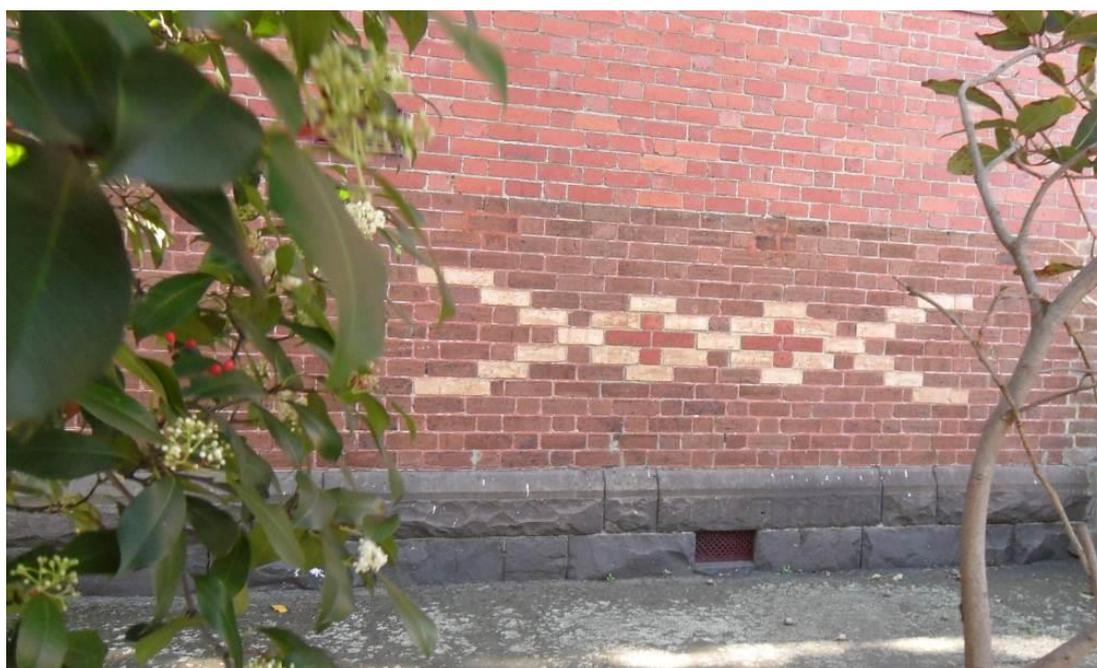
Remnant brickwork from the 1882 school building, seen at the north end of the Main building façade. (Source: context 2017)
